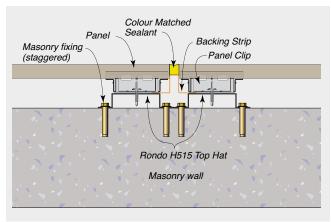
Alternative Sealant Filled Vertical Joint Detail - Plan
